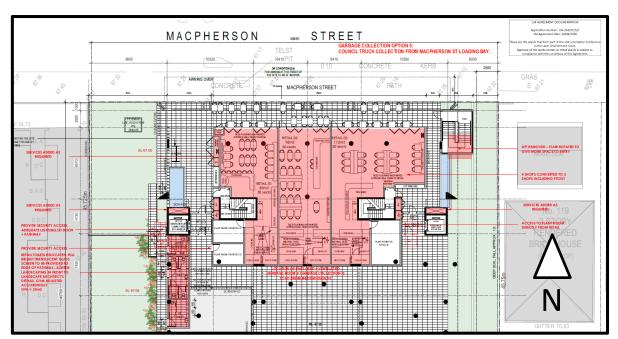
Approved ground floor plan of the development (associated with parent consent DA-264/2015/C)
